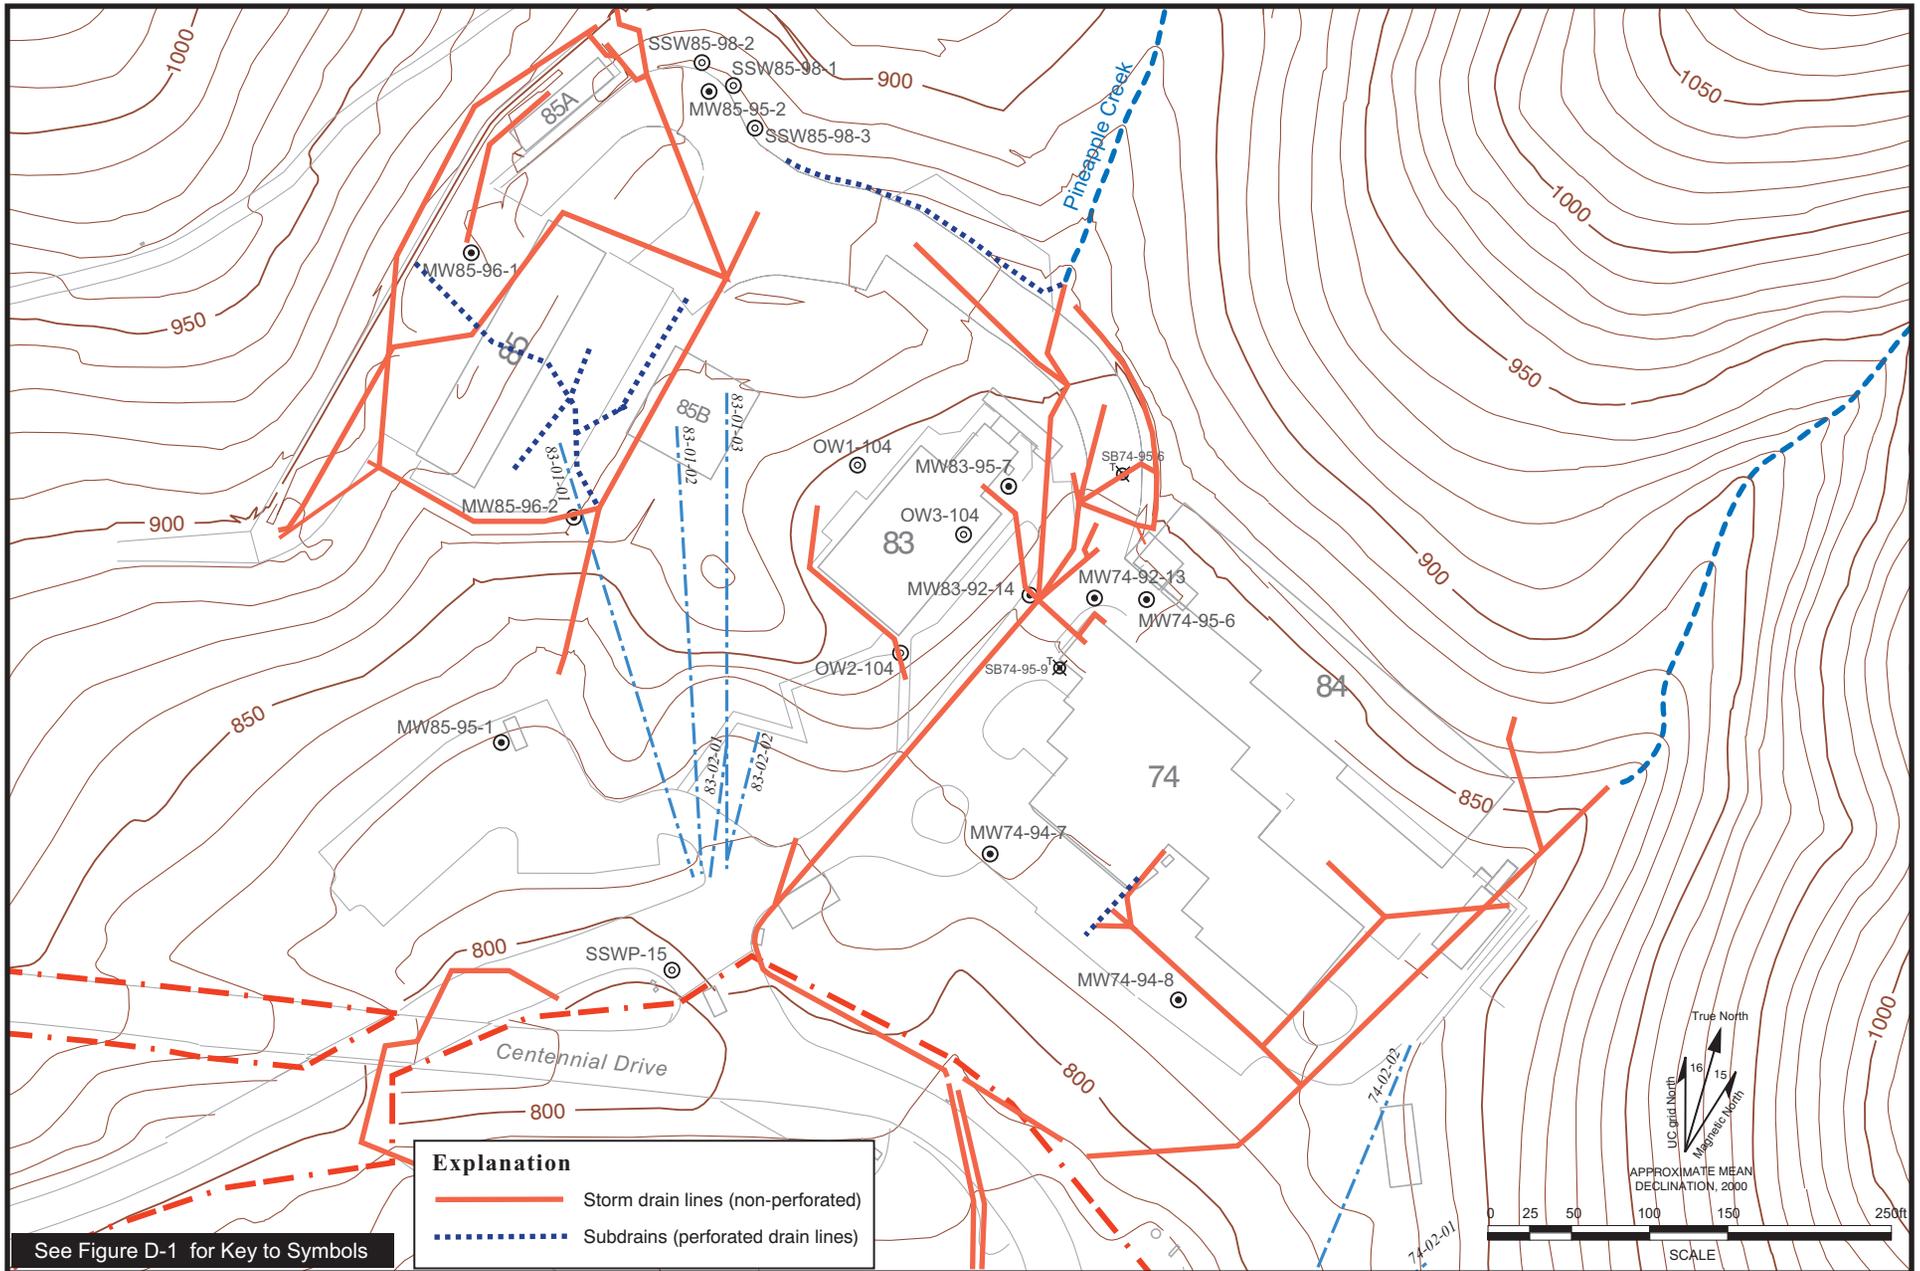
Storm Drains, Subdrains, and Hydraugers in Northeastern Outlying Area.
